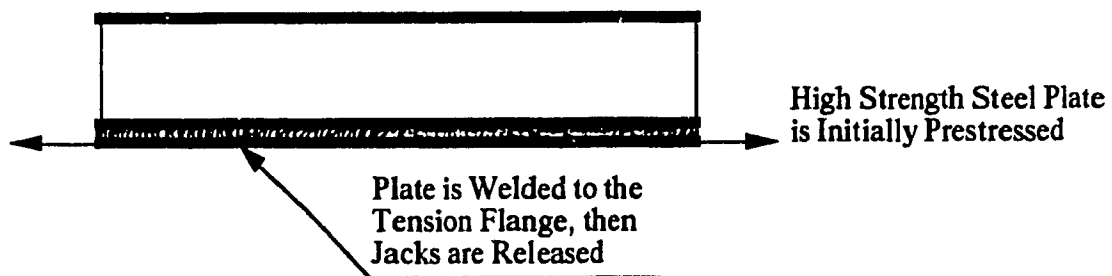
Prestressing by welding of pre-tensioned steel plates to the girder
